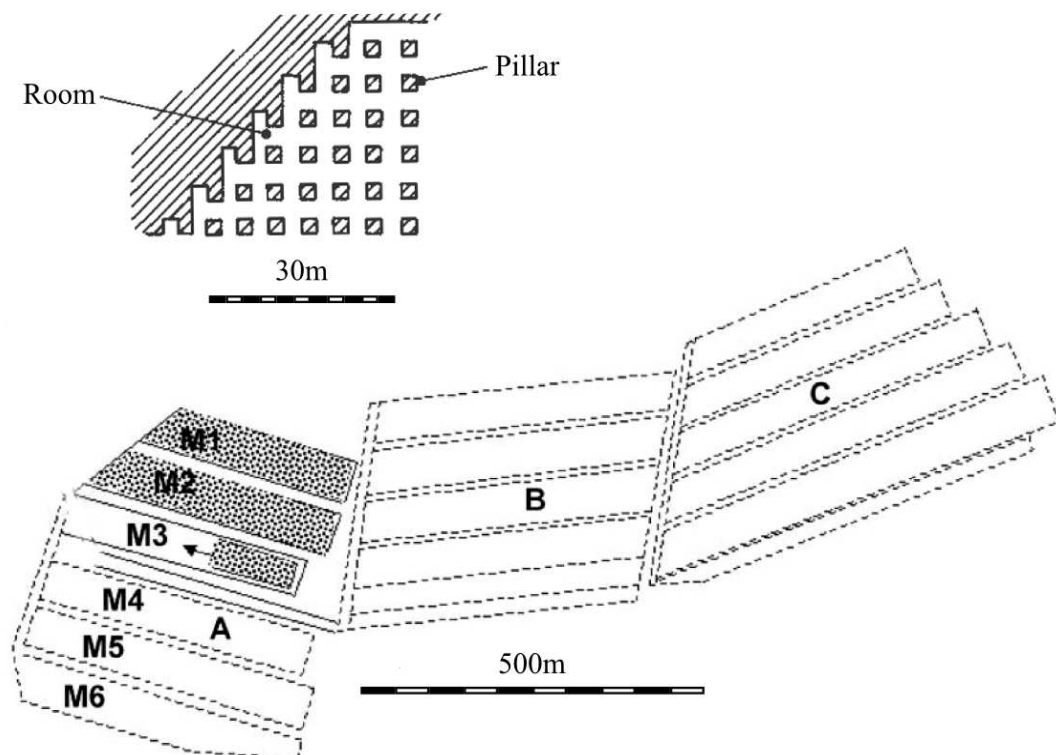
Difference in geometry and scale between a typical UK shallow room and pillar working and Turkish longwall mine workings (adapted from Healy and Head, 2003 and Yasitli and Unver, 2005).
